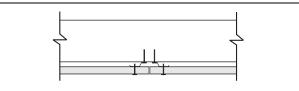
B.(a) Single Layer Butt Joint Details
